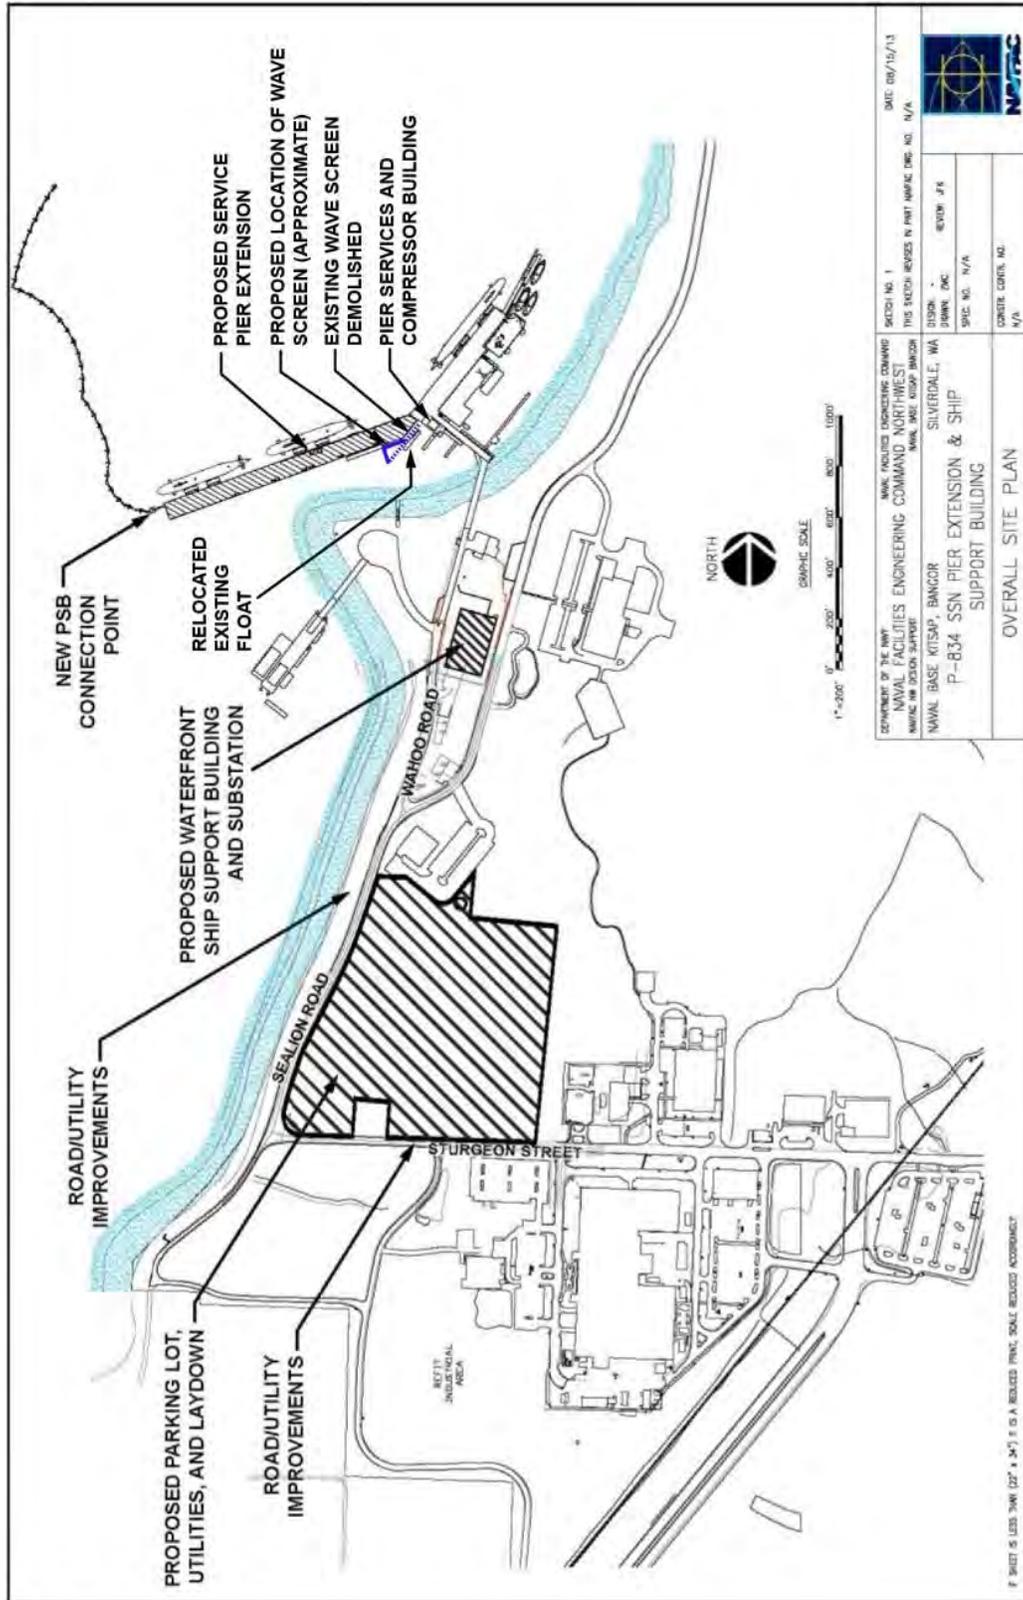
Service Pier Extension Alternative 3 (Long Pier Configuration)
